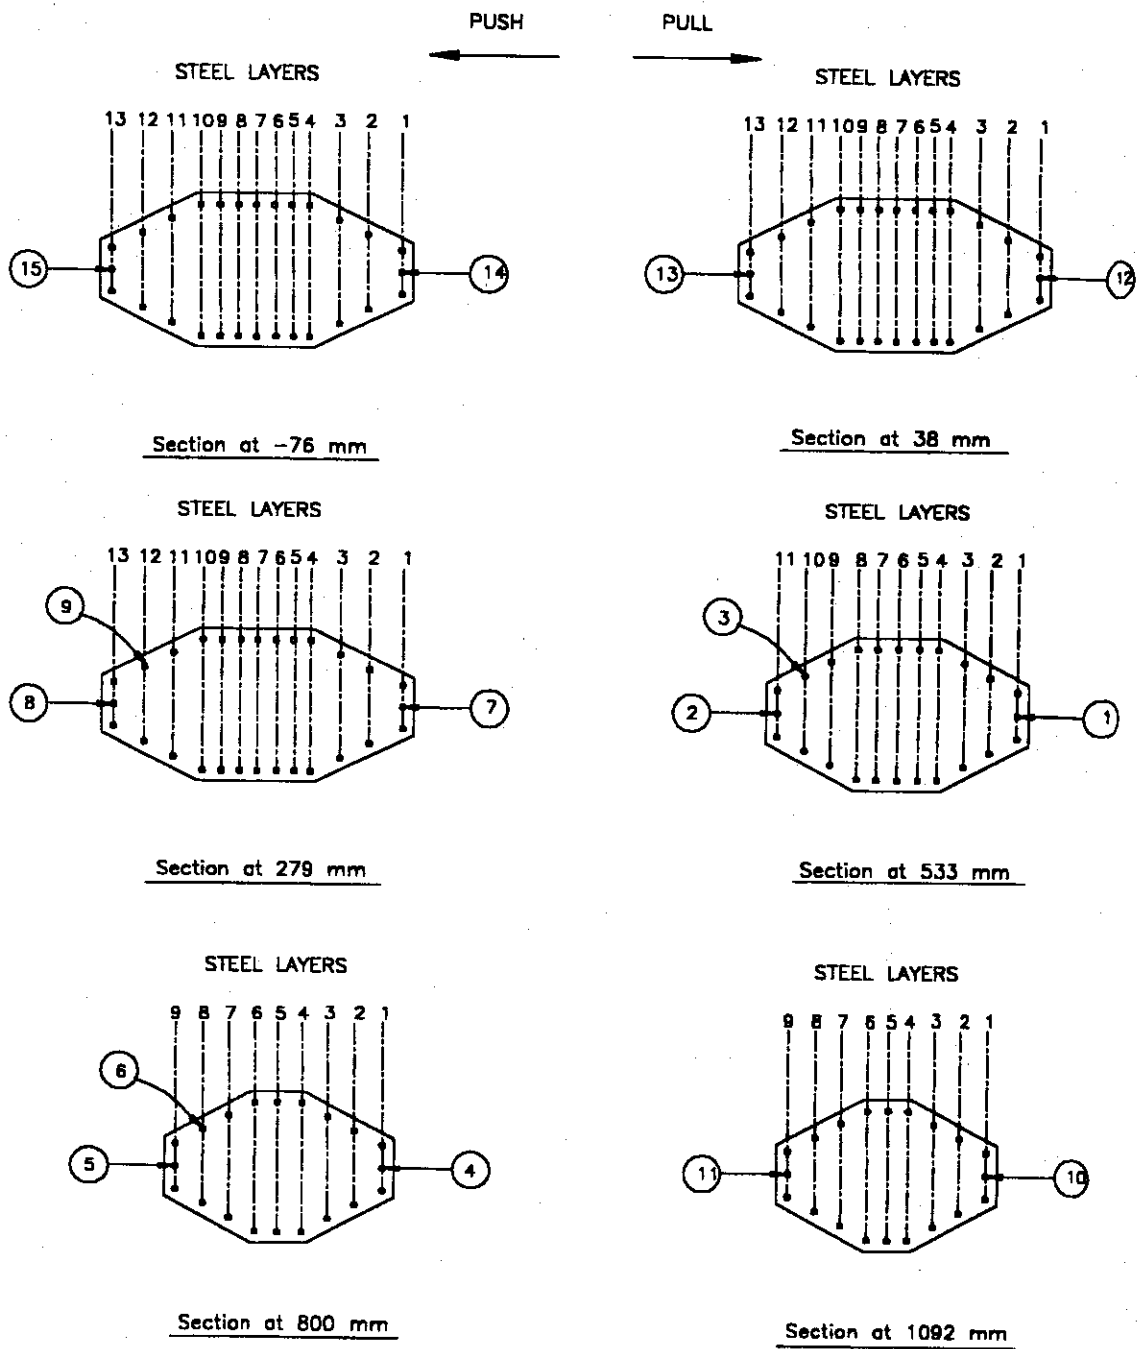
Strain Gages on Longitudinal Reinforcement of Specimen FA
